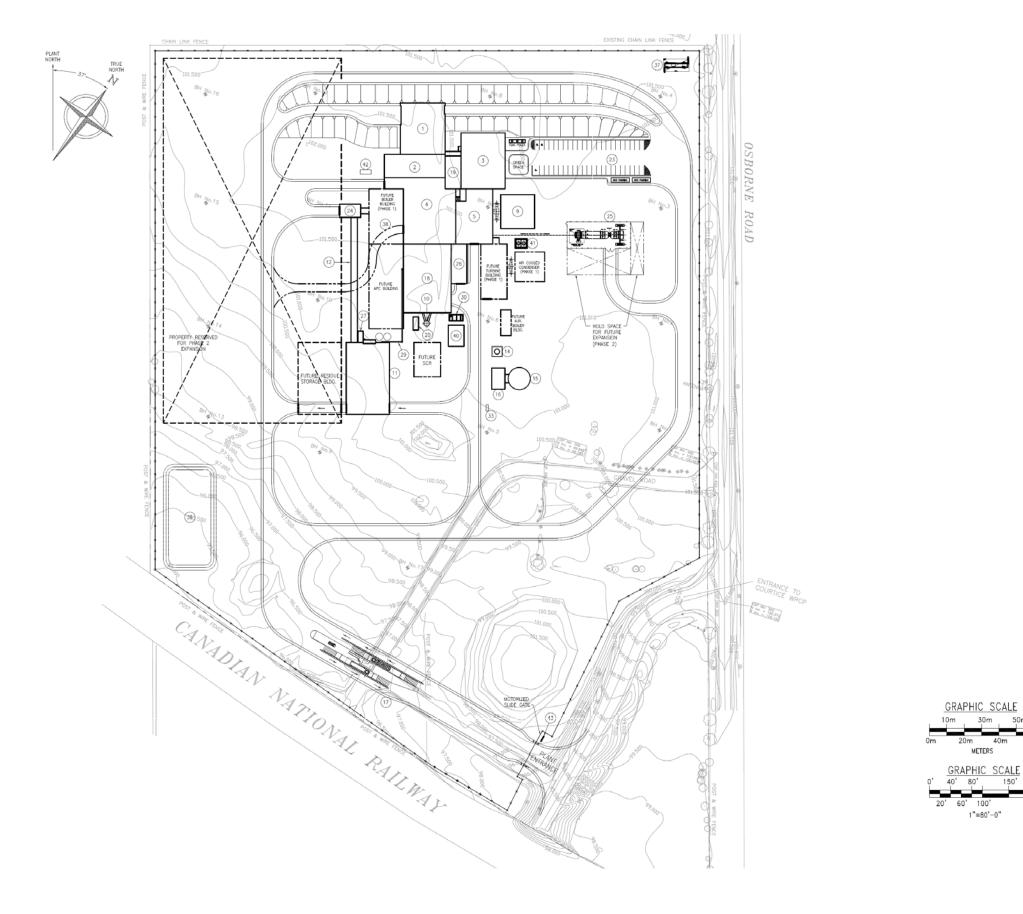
Proposed 140,000 tonnes/yr Facility Site Plan
